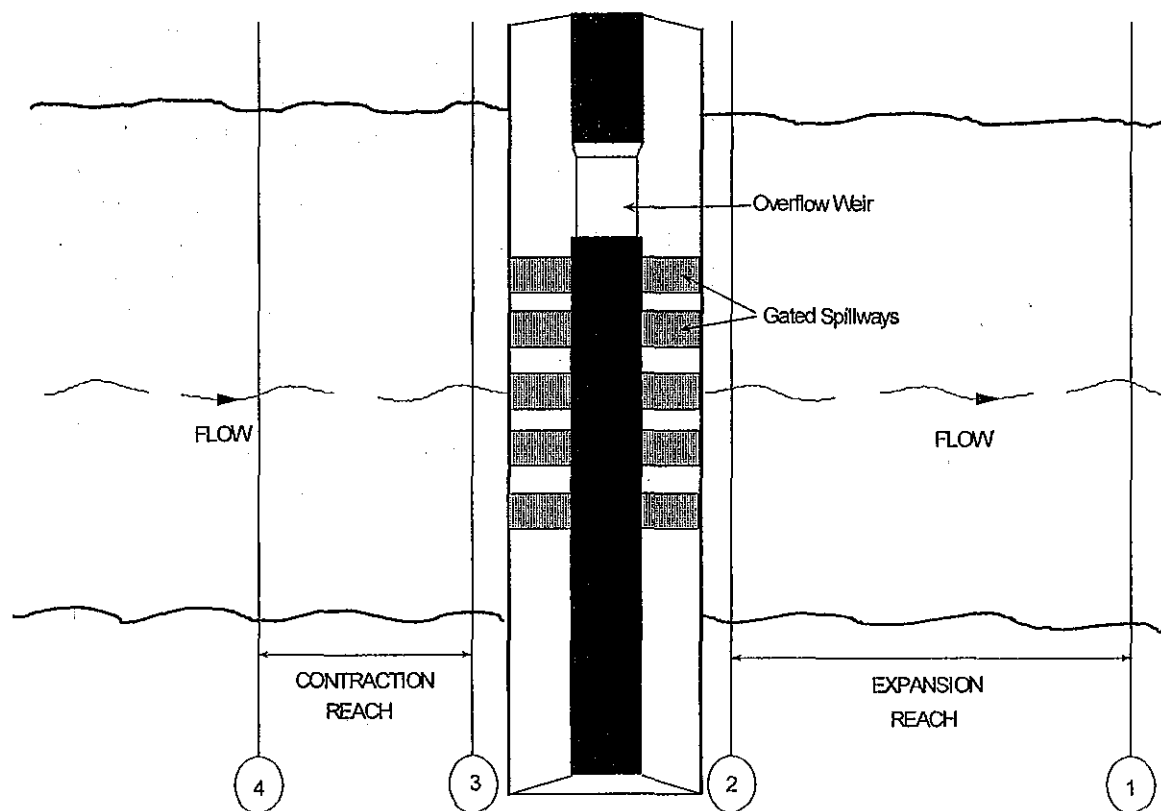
Cross Section Layout for Inline Gated Spillways and Weirs
